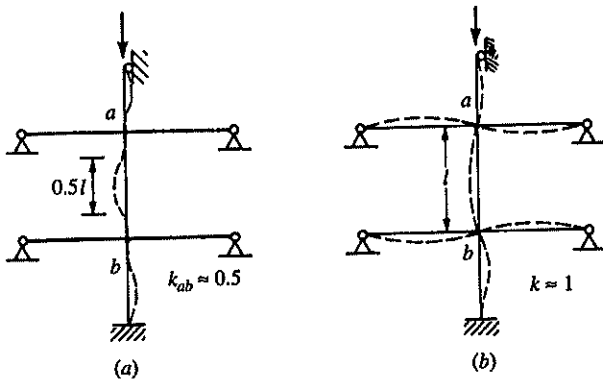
Influence of girder stiffness on the effective length of a column in a braced frame: (a) rigid girders, (b) flexible girders.
